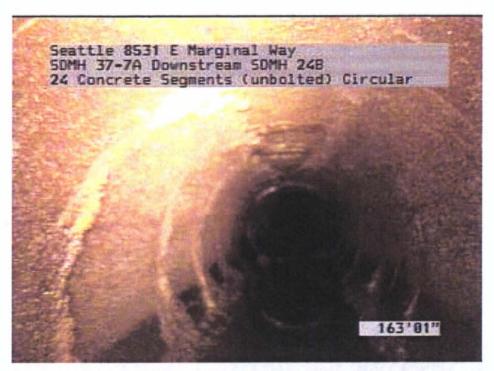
Pre-cleaning view of 24-inch Pipe looking downstream from approximately 163 feet downgradient of SDMH 37.7.
